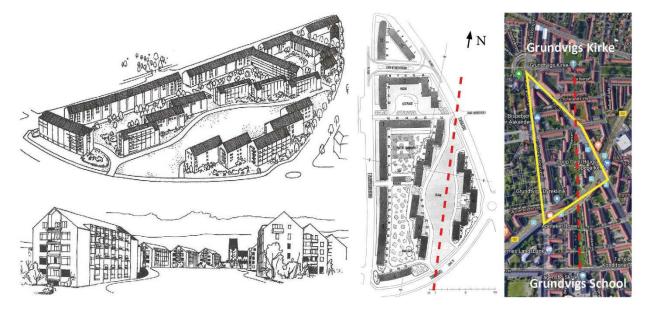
Original plans of Bispeparken with view on Grundvigs church (left), idea of visual connection between Grundvigs Church and Grundvigs School (right)
